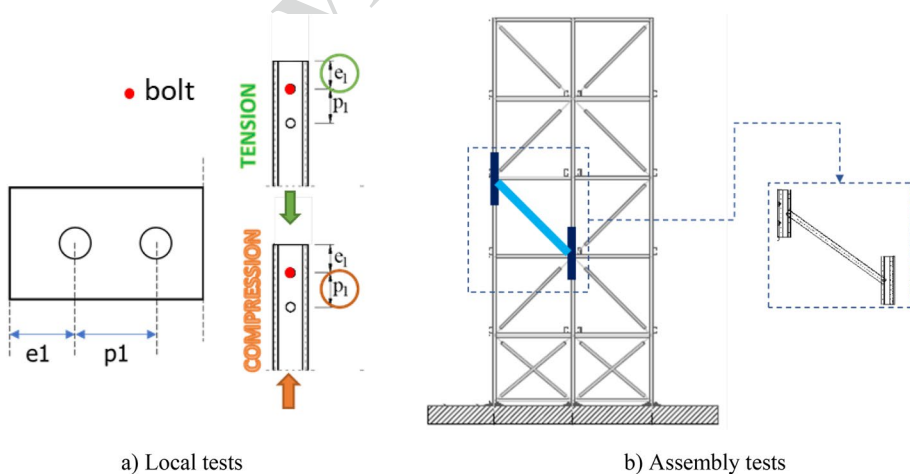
a Local tests: varying parameters for the different configurations of the tested components; b Assembly tests: component assembly and configuration
